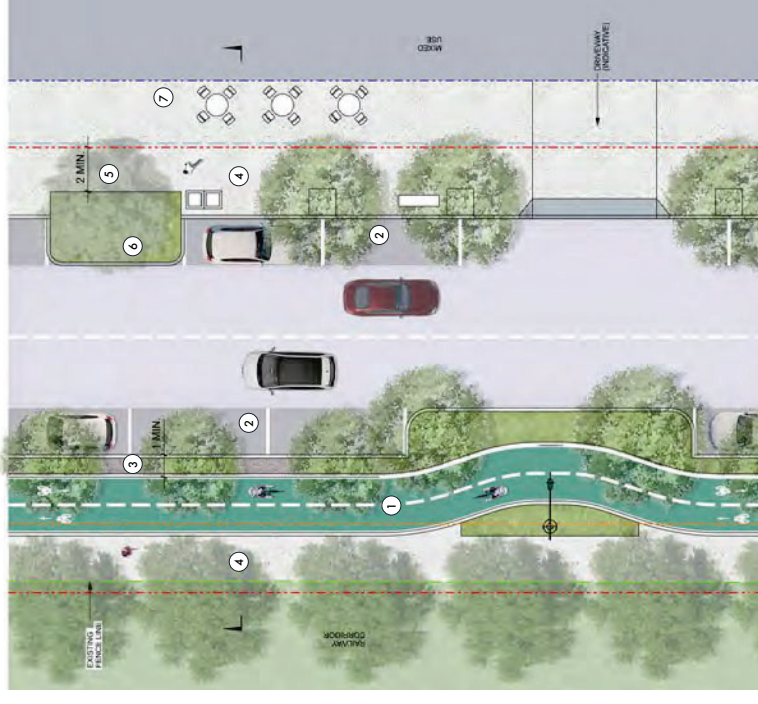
Blaxland Road South (Between Llewellyn Street and Train Station) - Plan
